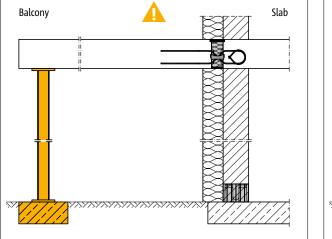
Schöck Isokorb® T type Q-Z-V6 to Q-Z-V10, Q-V6 to Q-V10: Section A-A; One-way reinforced concrete slab
